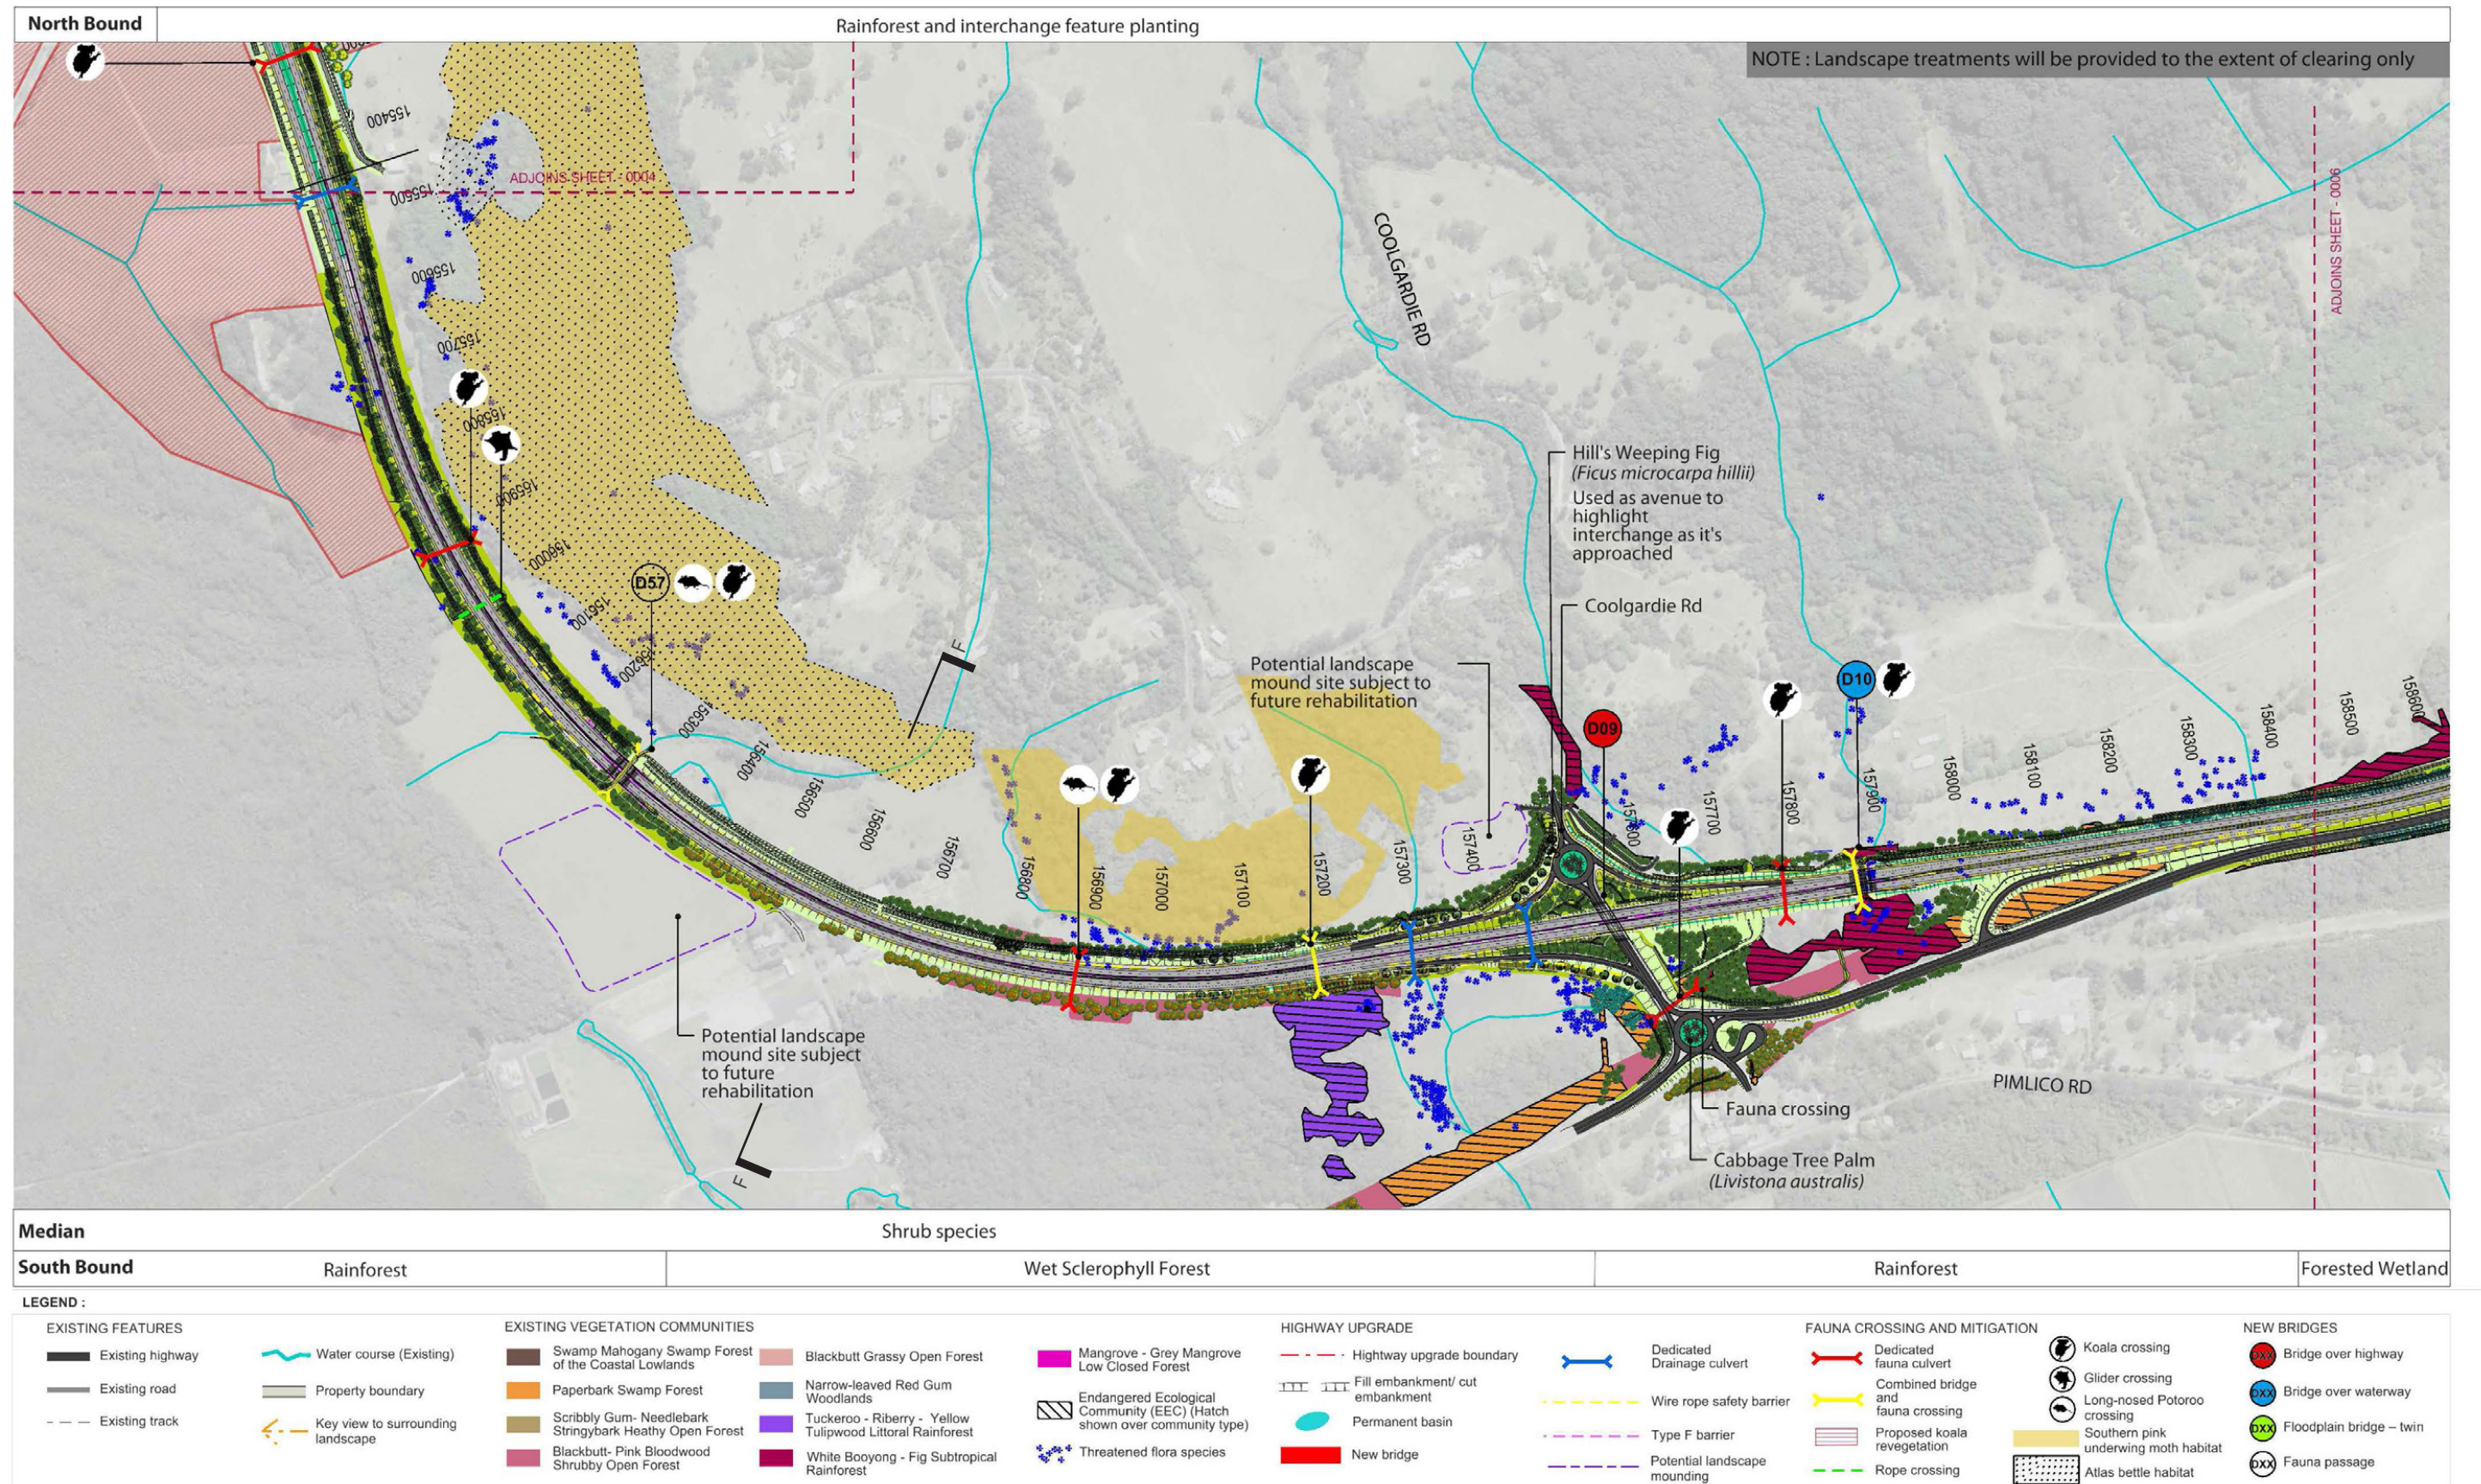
Urban and landscape design plan - Sheets 5 and 6 (Scale 1:8000)
